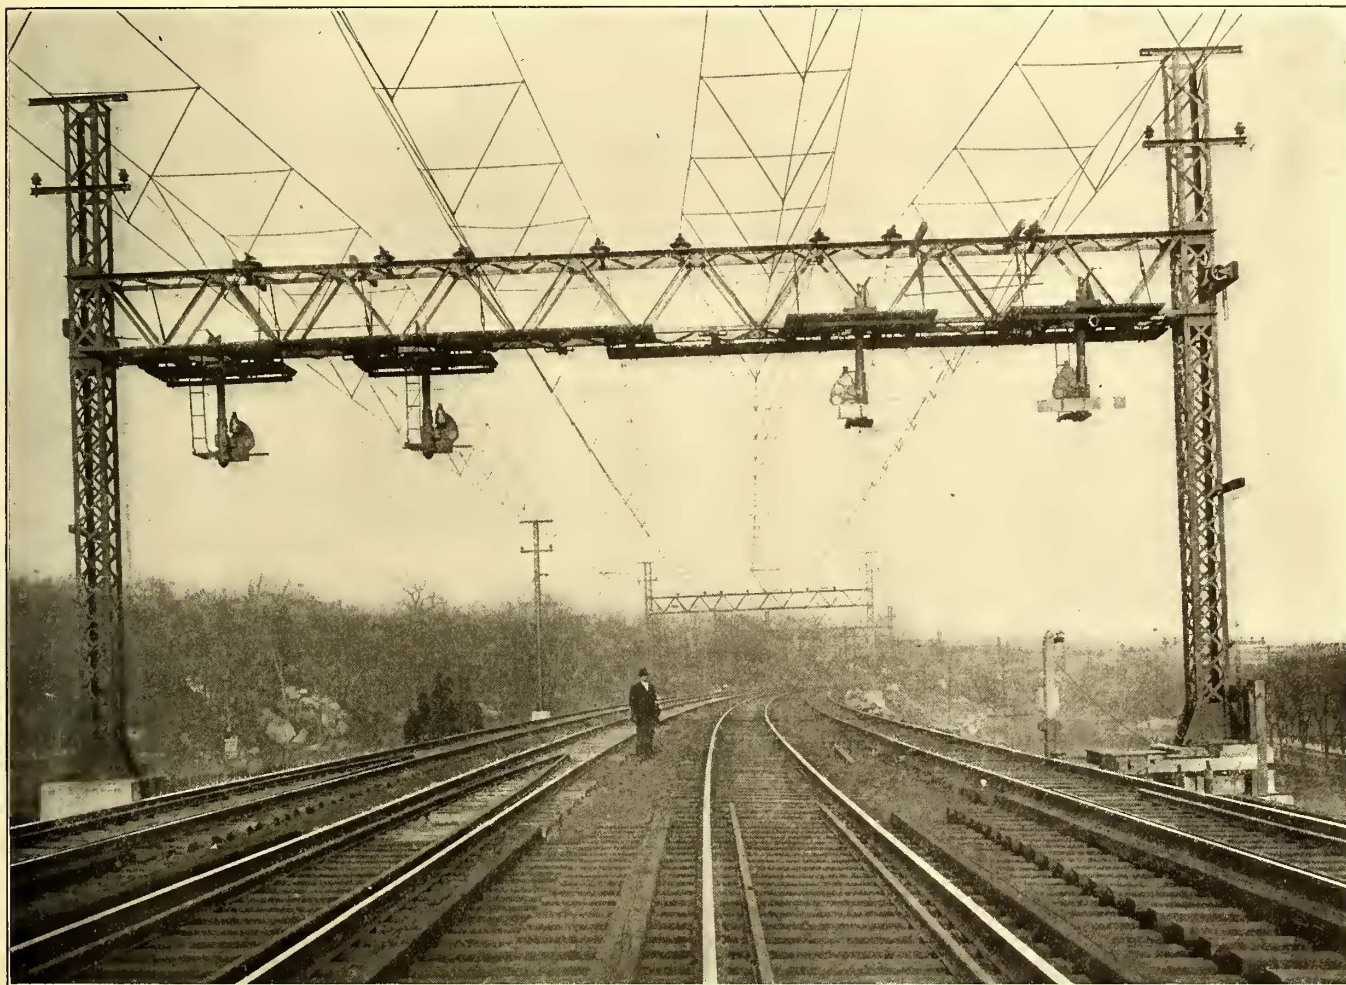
ANCHOR BRIDGE NEAR PELHAM STATION, NEW HAVEN RAILROAD
